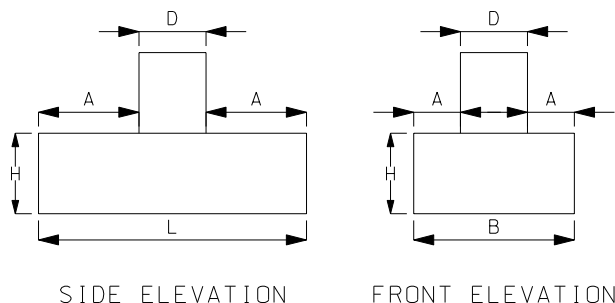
Elevations and Standard Variables for Spread Footings
